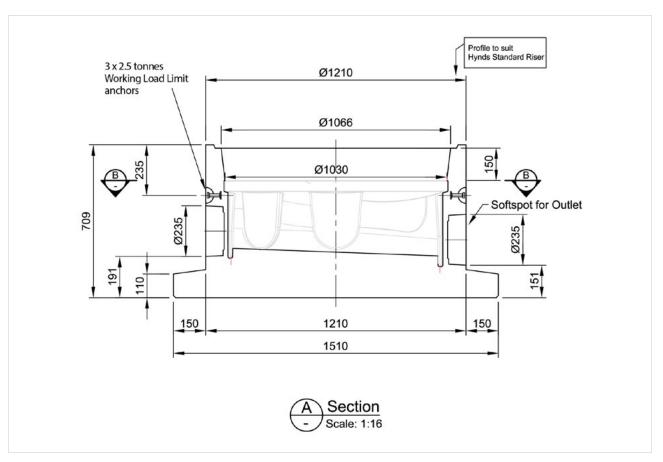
Section 'A-A' With Inlet and Outlet Pipe Fitted of Ø150mm PVC Hybencher
